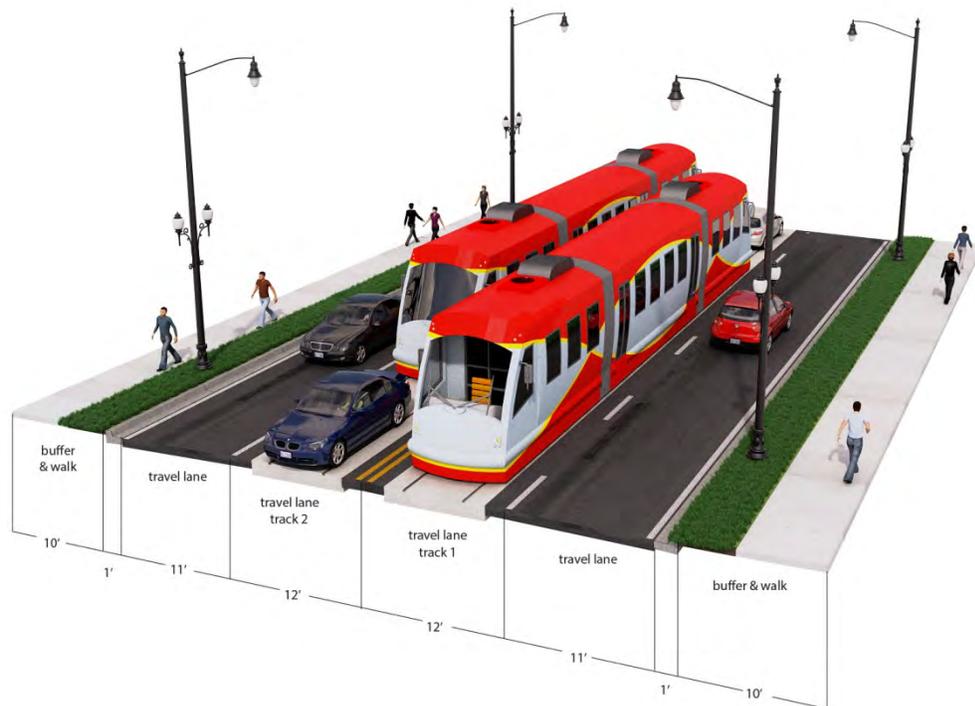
Median Running Typical Section (Option 4 - Shared Travel Lane)
